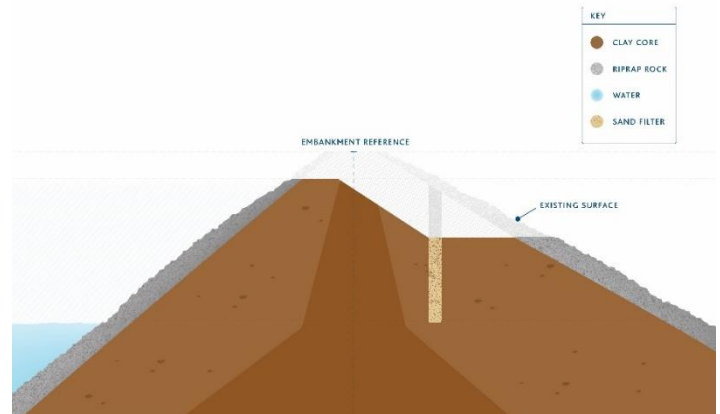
Cross section of the dam wall with the trench backfilled with a sand filter.
